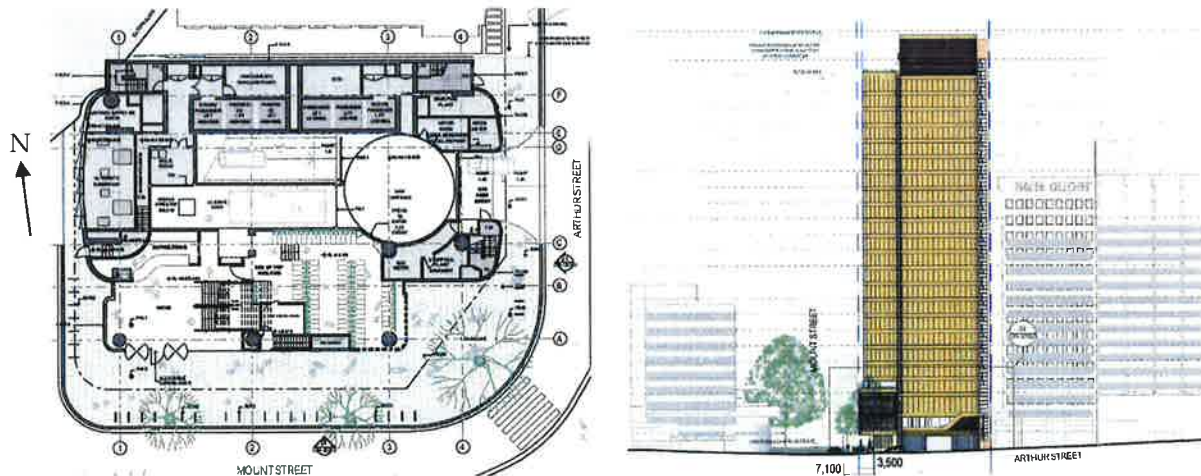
Ground floor plan (L) and east elevation (R) of the proposed development
